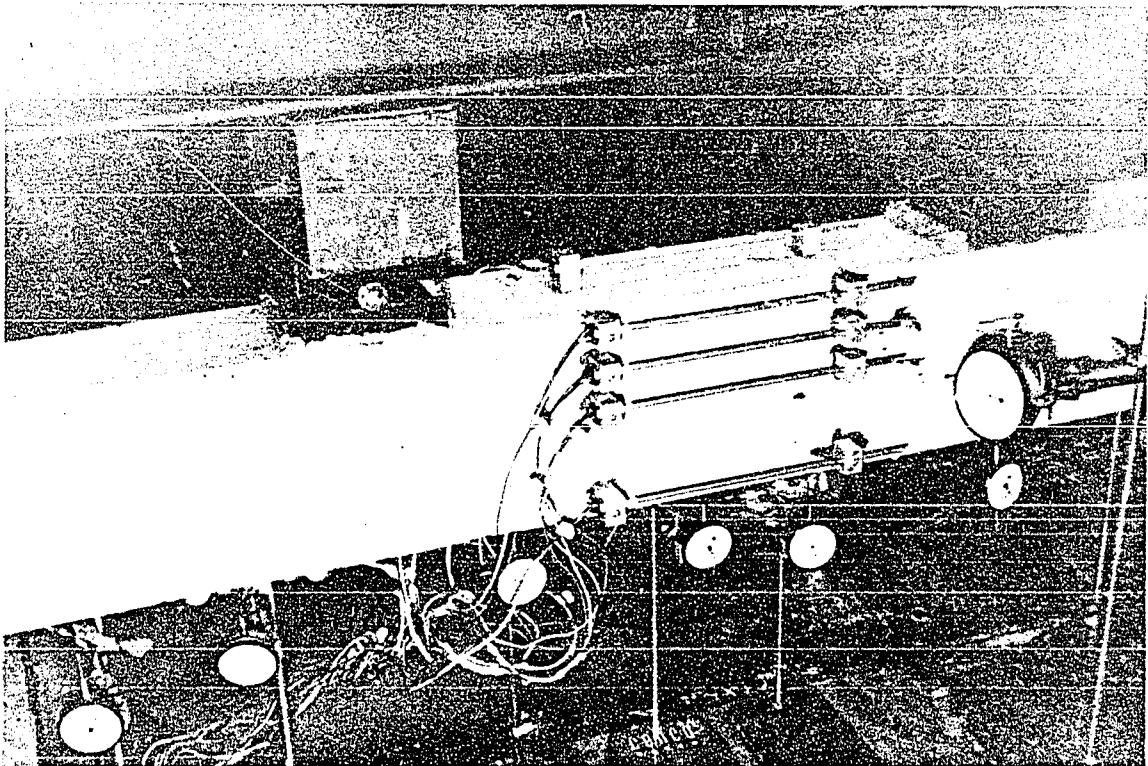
POSITION OF DEFLECTION BRIDGE.
